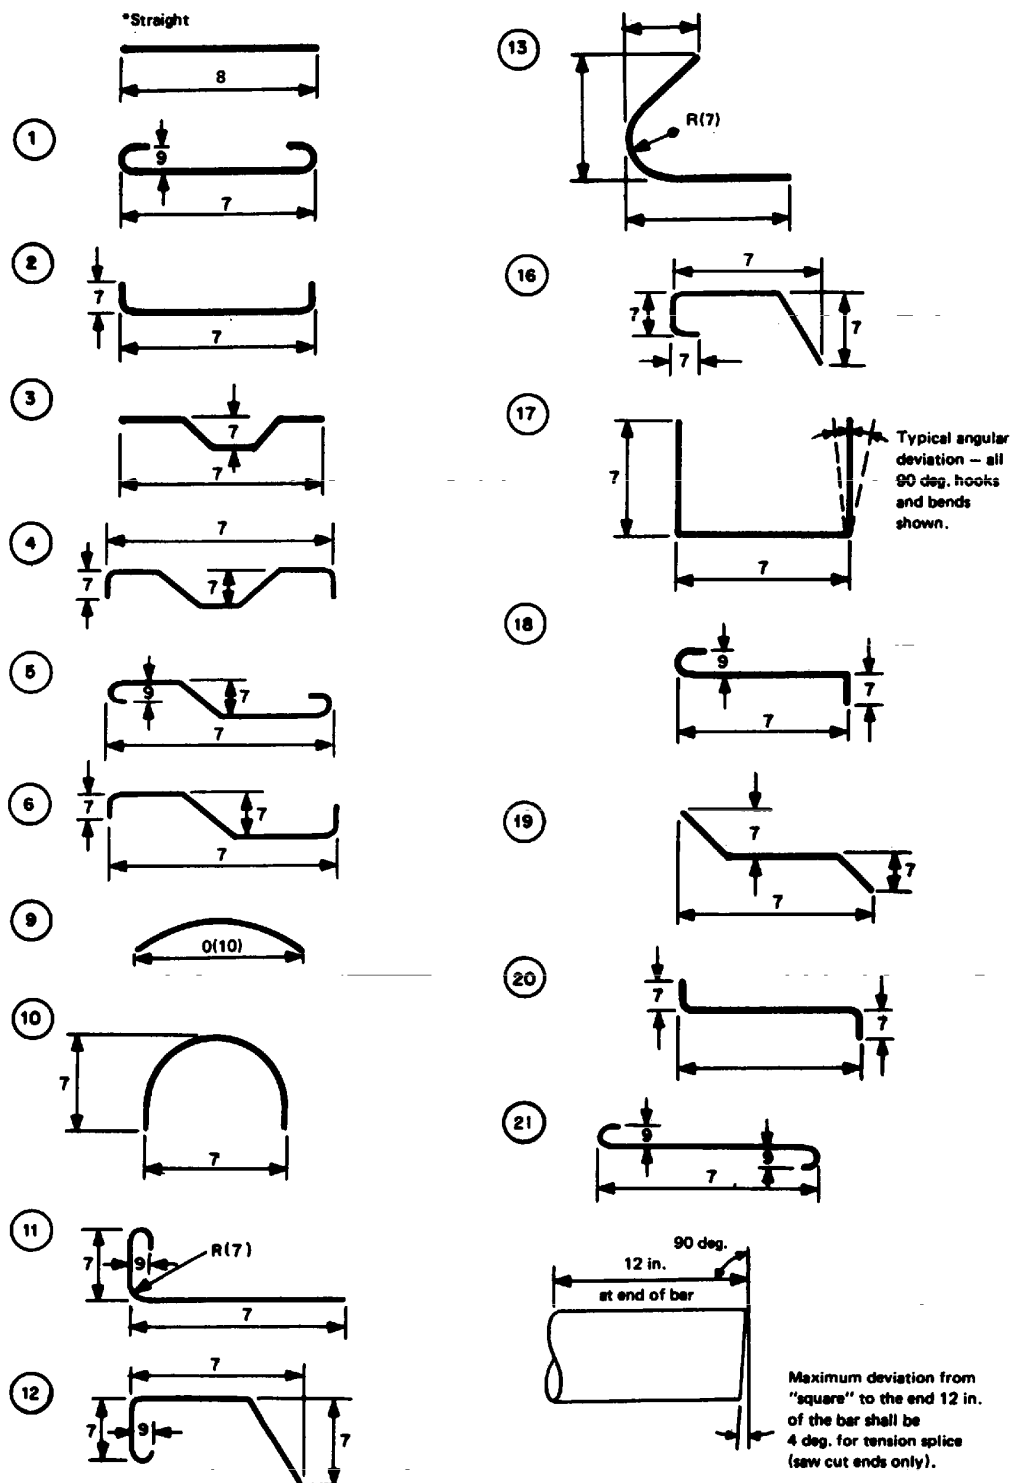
STANDARD FABRICATING TOLERANCES FOR BAR SIZES #14 AND #18
